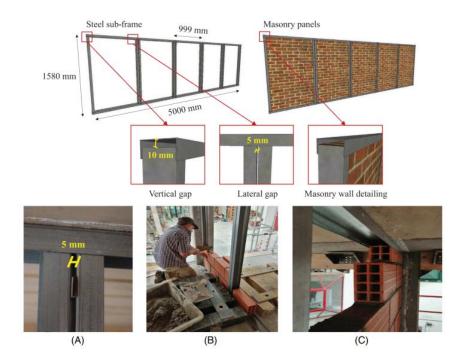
Low damage masonry wall (A) 5mm internal gap (B) Rocking Panel (C) Brick layers [19].
